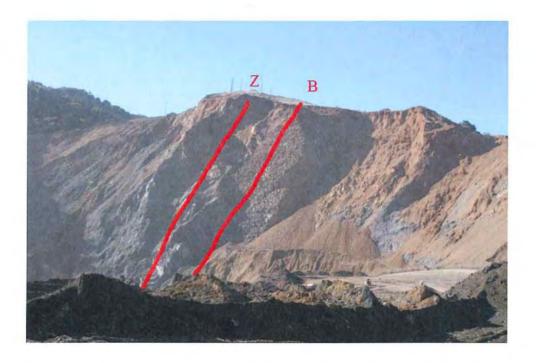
The approximate location of cross-sections Z-Z' and B-B' (red lines).
